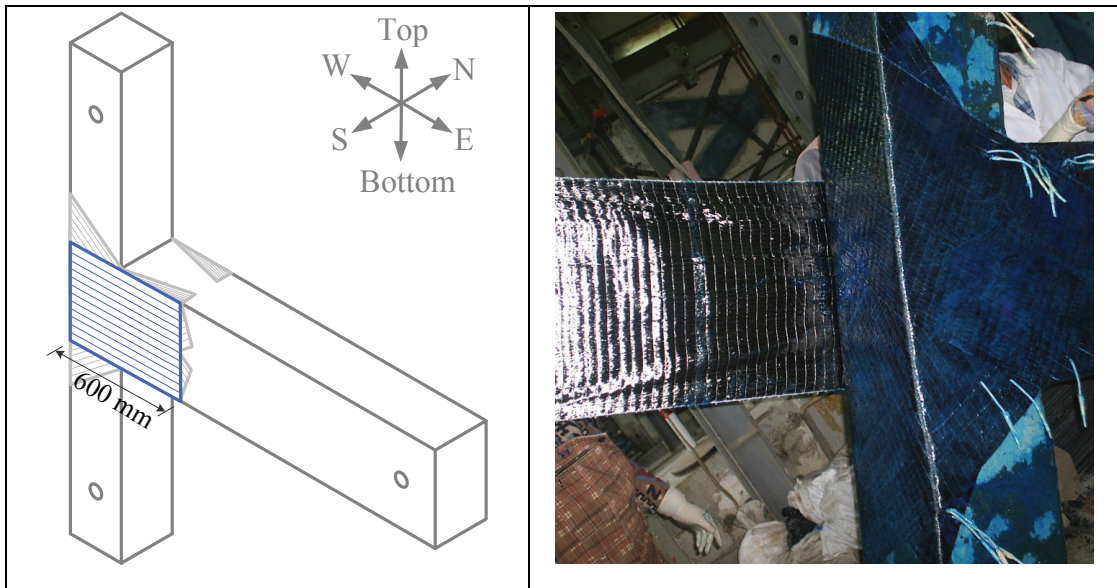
U-shaped CFRP sheet application, step (ii)
